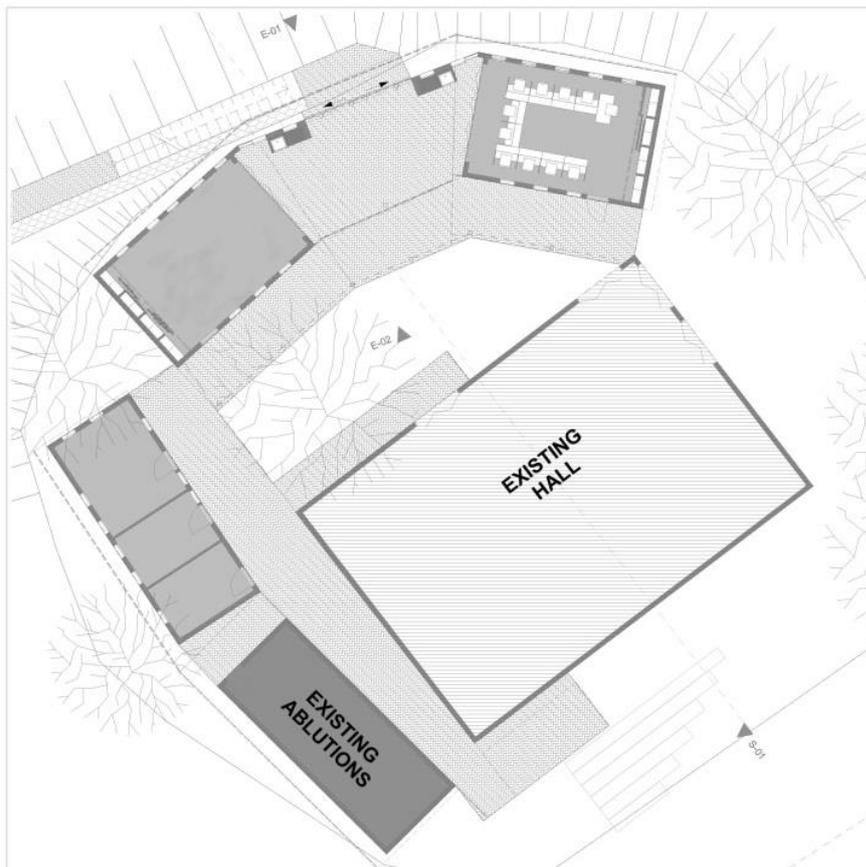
Ingane Yami Children's Village ECD Plan. Not to Scale.
